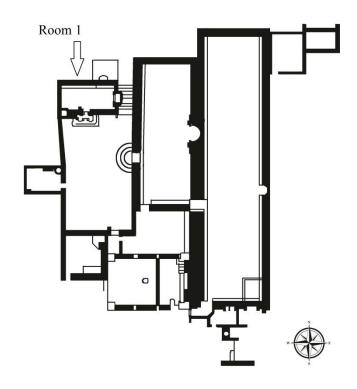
Plan of "Rooms" (Room 1 in top left corner) (adapted from MIFAO 59:1, Plate I)
